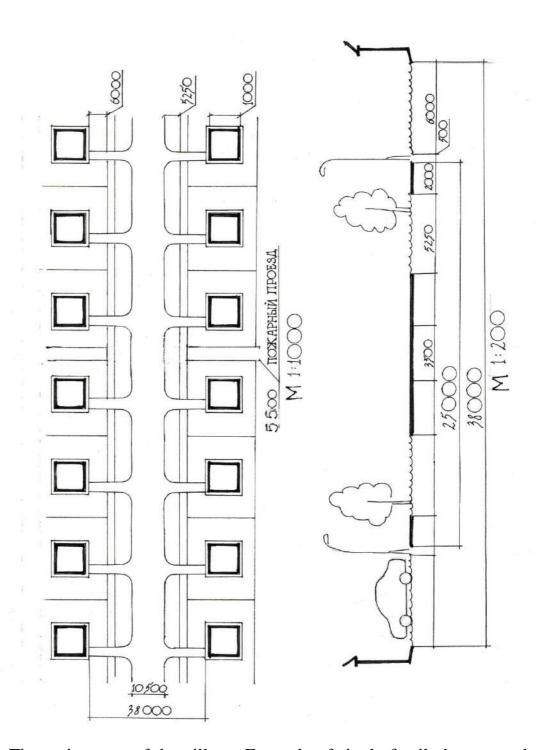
The main street of the village. Example of single-family houses and cross-section of the street development
